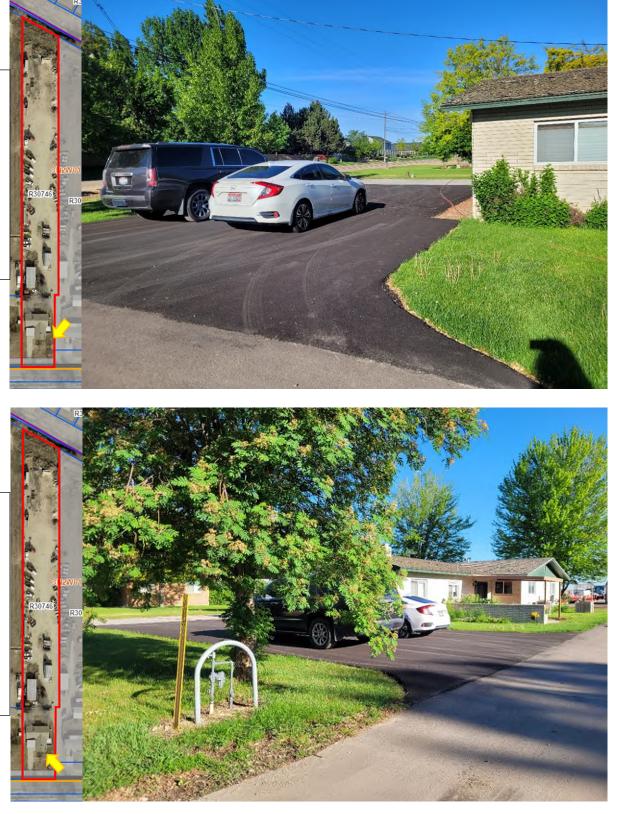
Taken on the subject property's shared easement, facing northwest towards the office.
